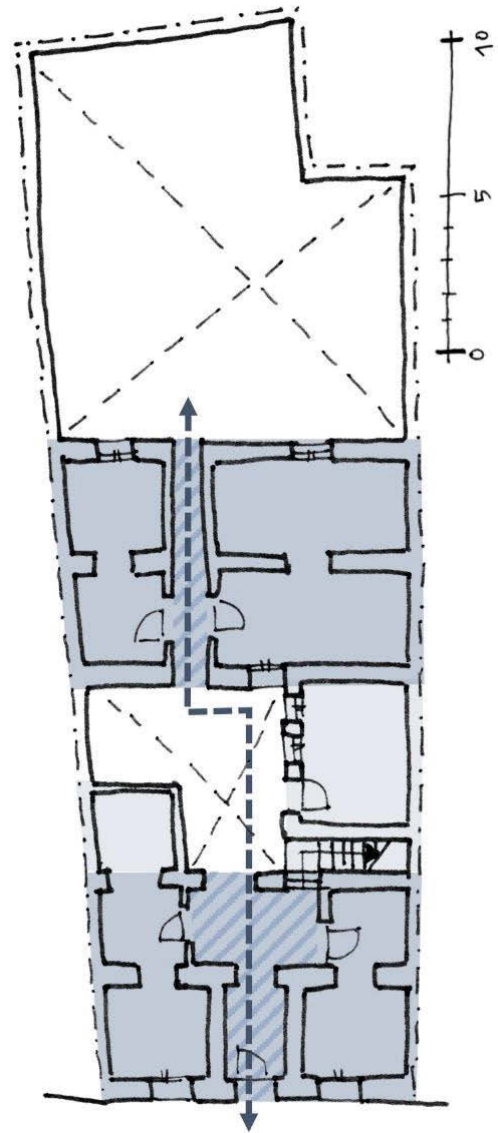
Groundfloor plan. House in Utrera (Source: PEPCH Utrera 2018).
